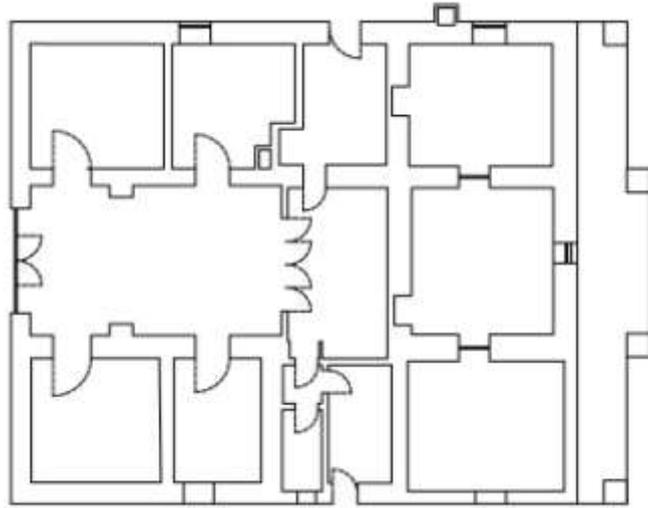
Basement floor of the house at 63 lot 20 parcel
